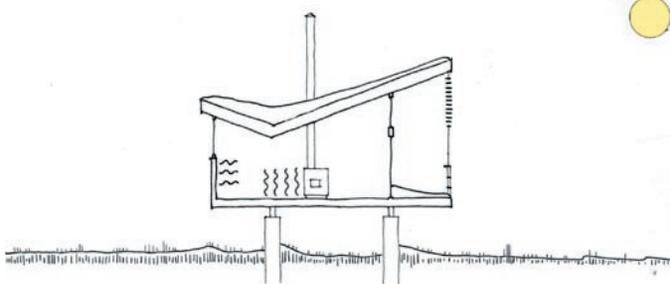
| Winter heating diagram. The north facing windows can be shuttered to prevent heat loss. Roof slope allows sunlight to penetrate, surfaces absorb heat during the day to be radiated at night.
